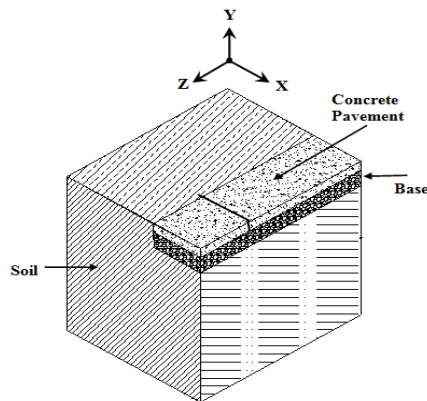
Schematic View of Quarter of the Jointed Concrete Pavement System.
